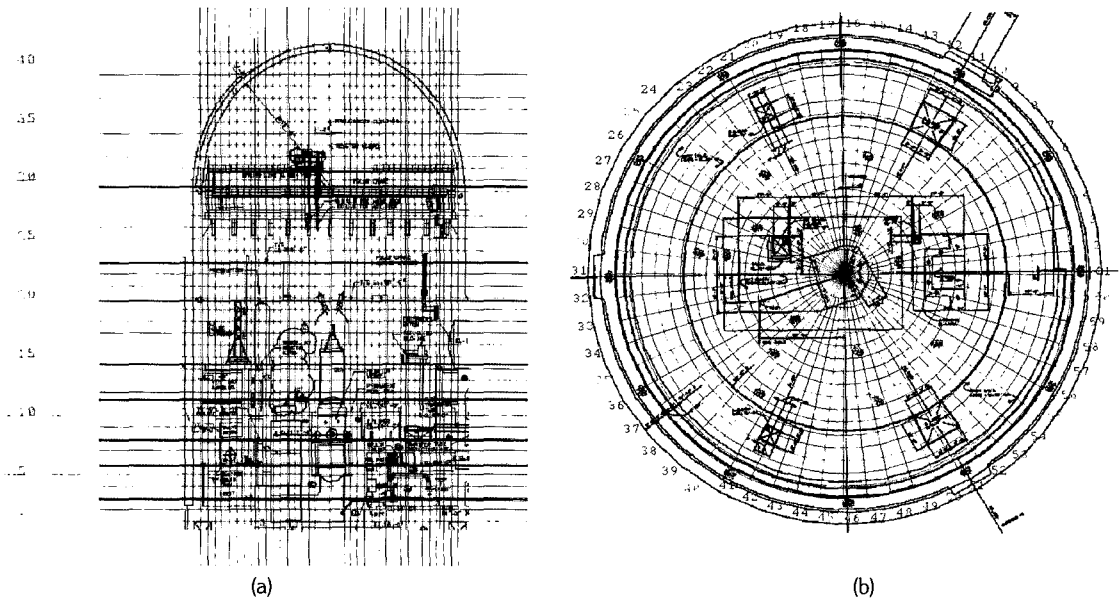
Generated Cylindrical Mesh Overlapped on the Containment Cut Drawing, (a) vertical cut view, (b) horizontal cut view at elevation 81ft
